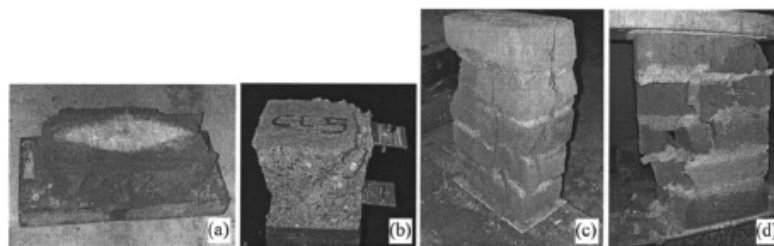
Typical failure modes of: (a) brick units, (b) mortar cubes and (c), (d) masonry prisms [17].
